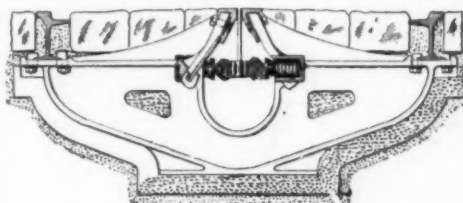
ELECTRIC RAILWAY CONDUIT—SECTION AT YOKES.
